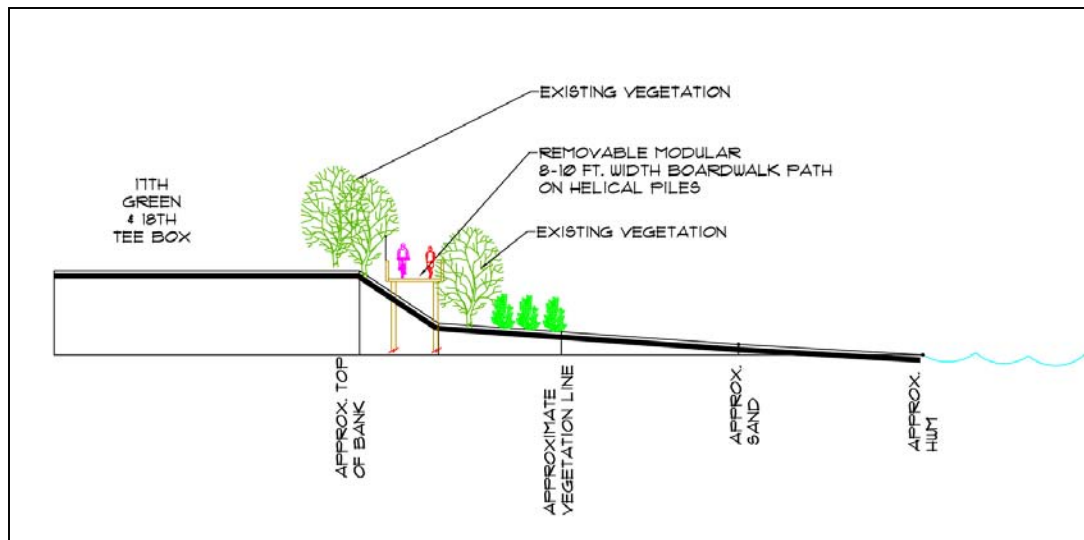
Cross-section of proposed helical pile boardwalk at the 17th green and 18th tee
